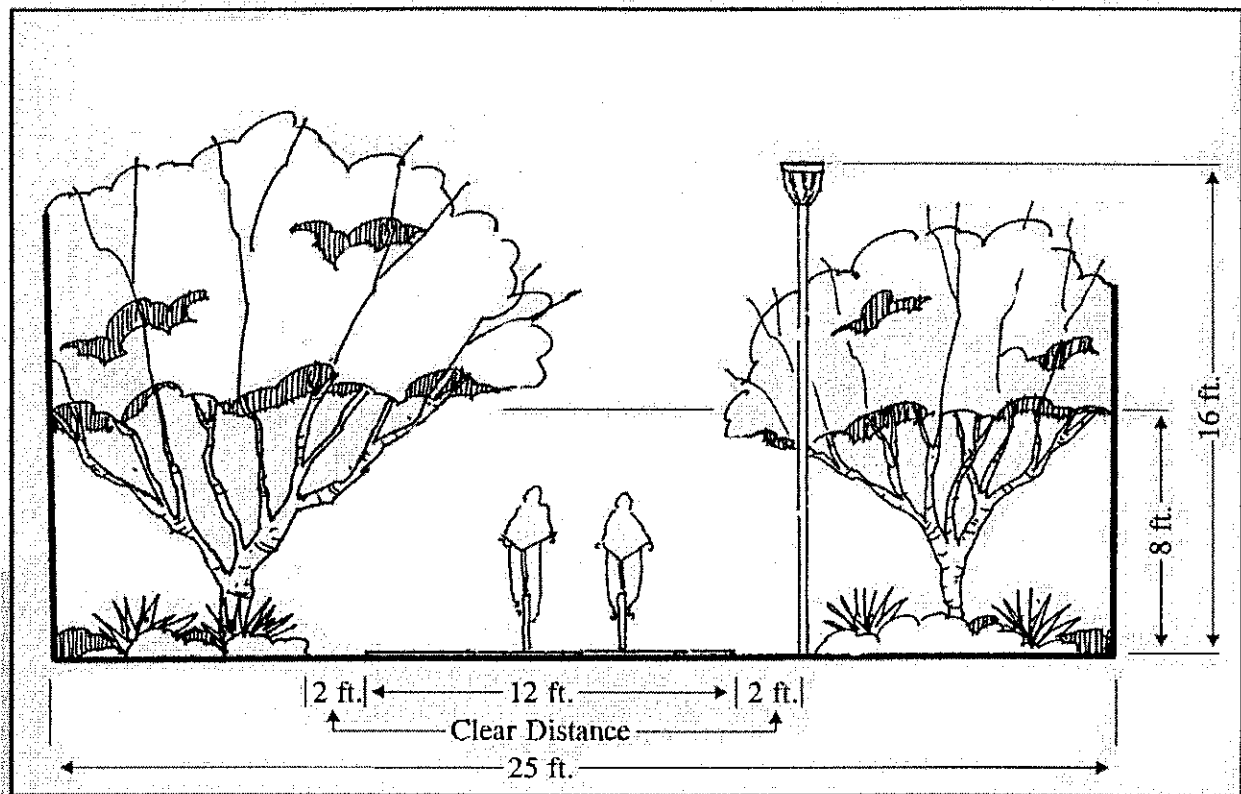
Recommended Path/Trail Section, Provided by the Tempe Multi-Use Path System Detailed Plan.
